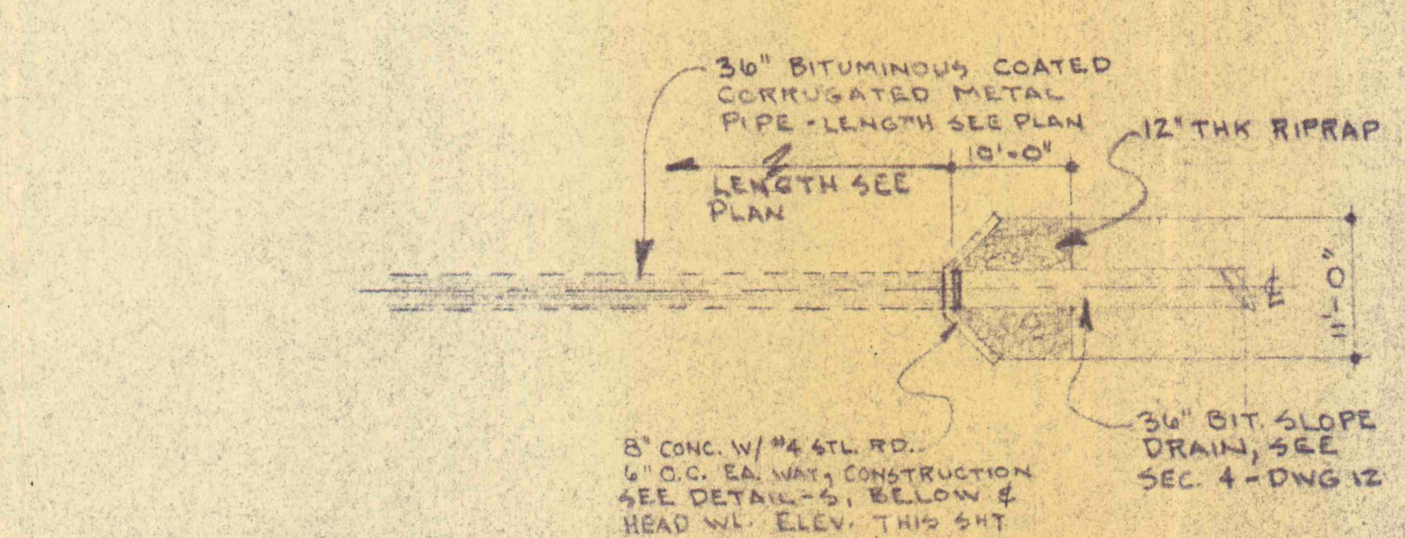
DETAIL OF CONNECTION DITCHES "A" & "B" - (J)
